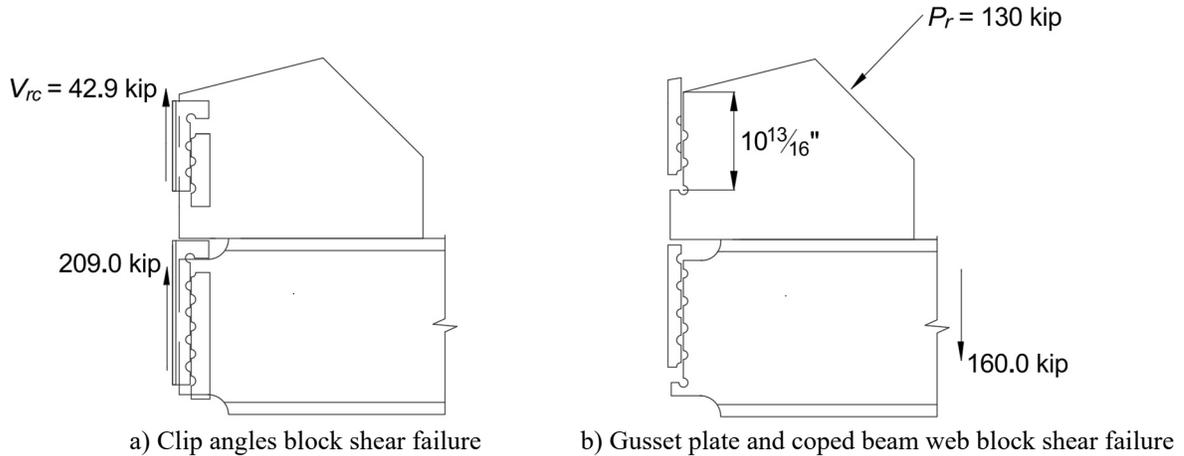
Block shear failure patterns of the clip angles (a) and wide-flange section web and gusset plate (b)
